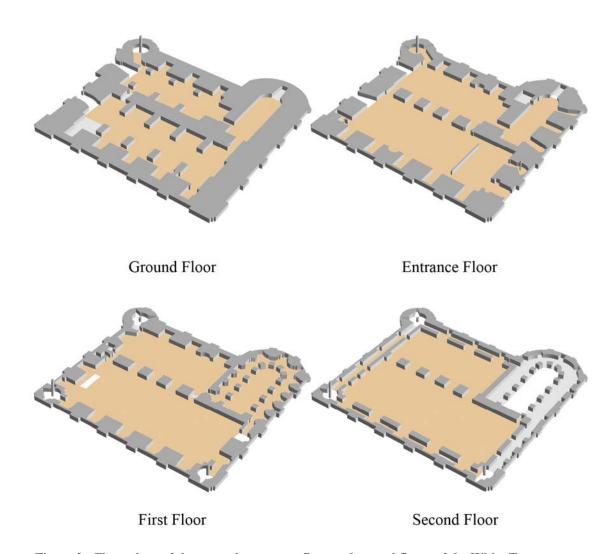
Floor plans of the ground, entrance, first, and second floors of the White Tower.
